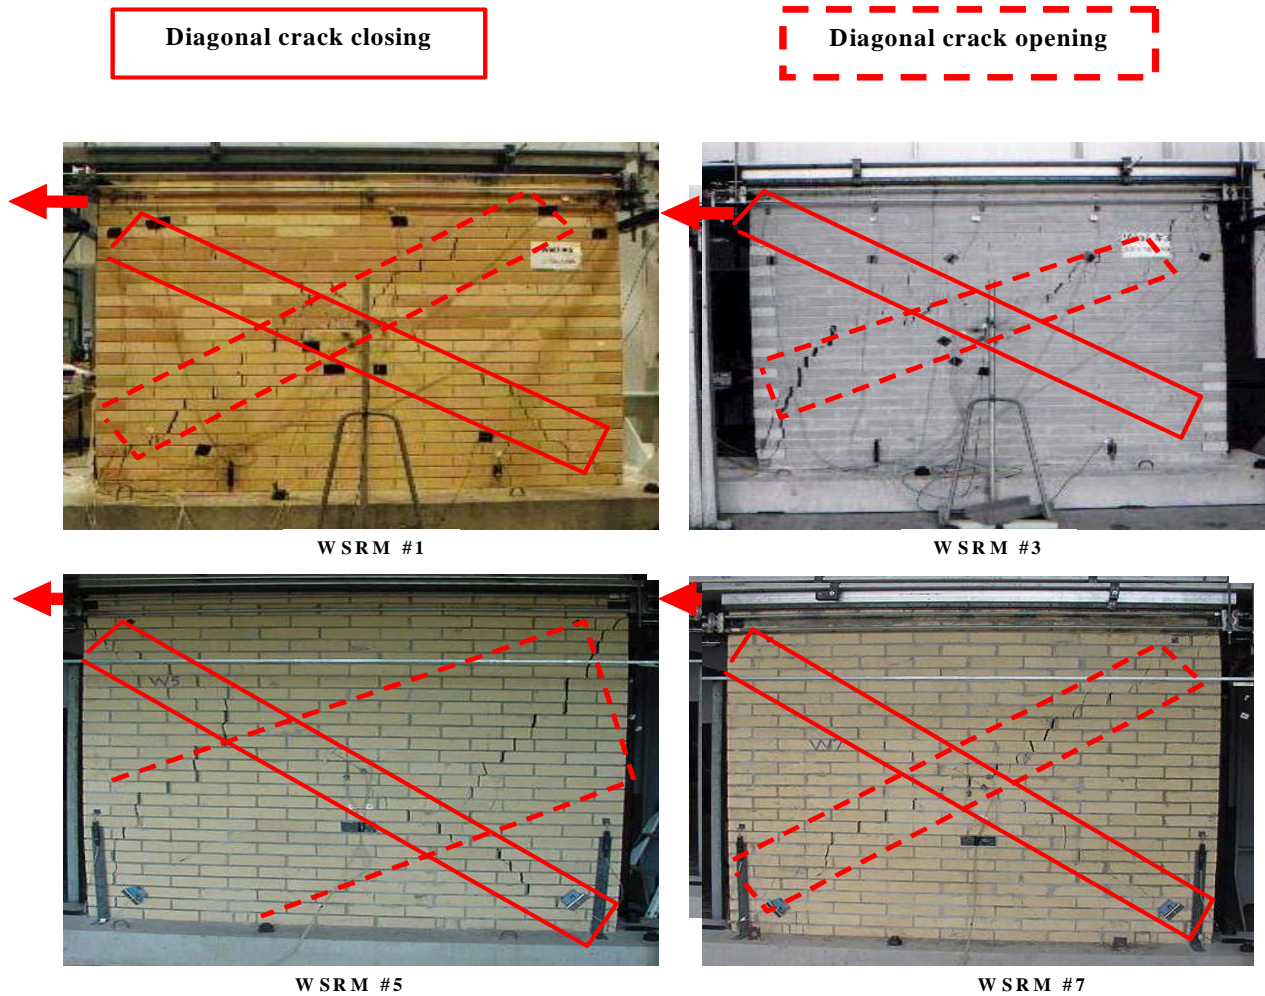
Crack patterns of WSRM walls tested under reverse monotonic loading
